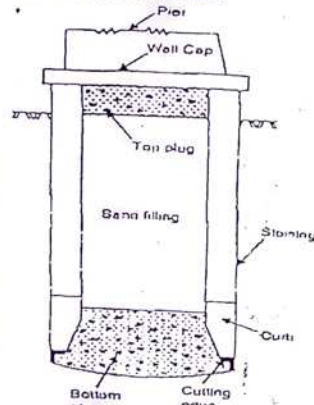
SECTION OF A WELL FOUNDATION.
